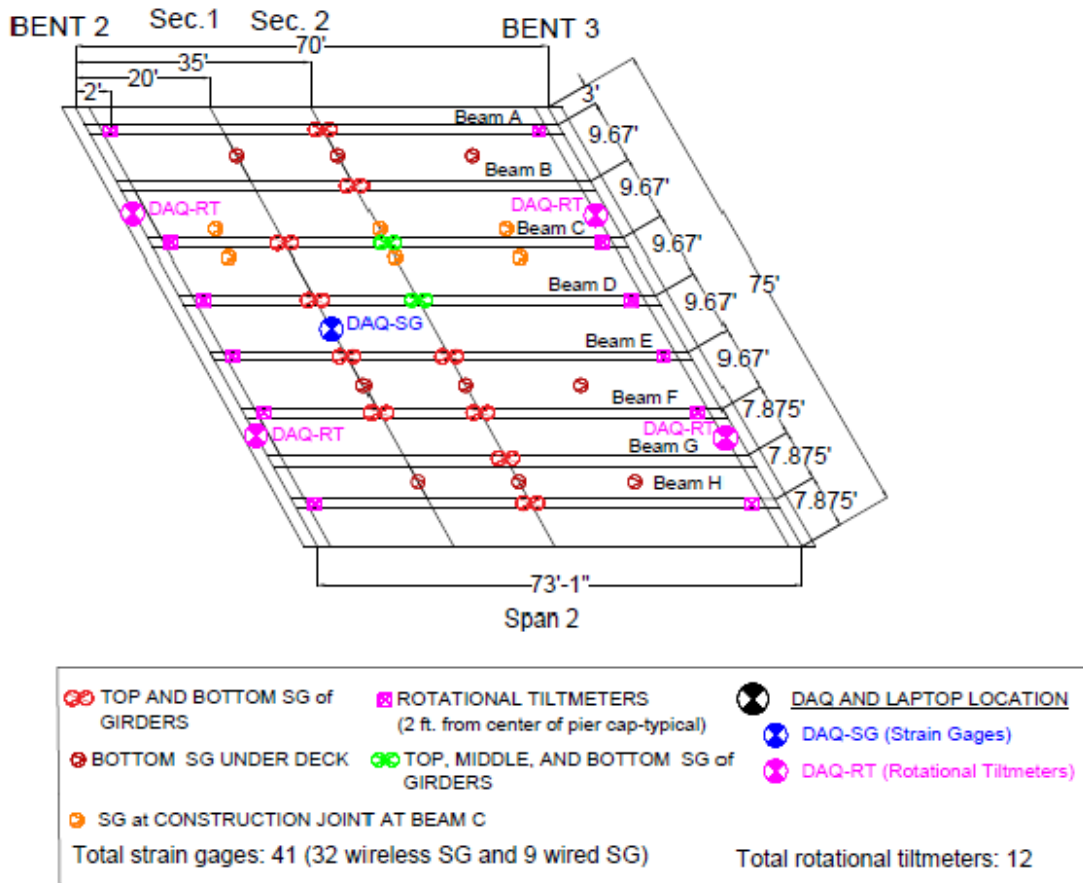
Follow up Instrumentation plan for load testing of EB replaced deck
